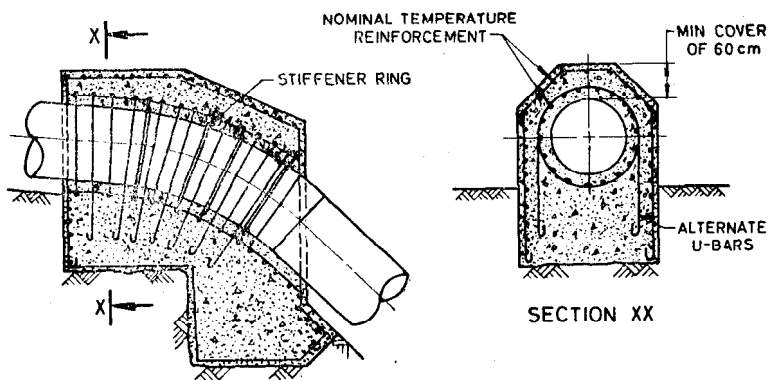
TYPICAL OPEN TYPE ANCHOR BLOCK
